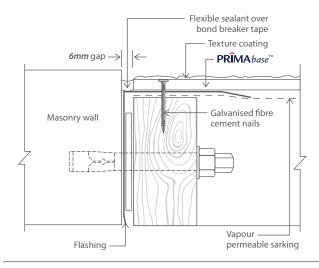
Vertical Movement Joints - Intersection with Masonry Wall
